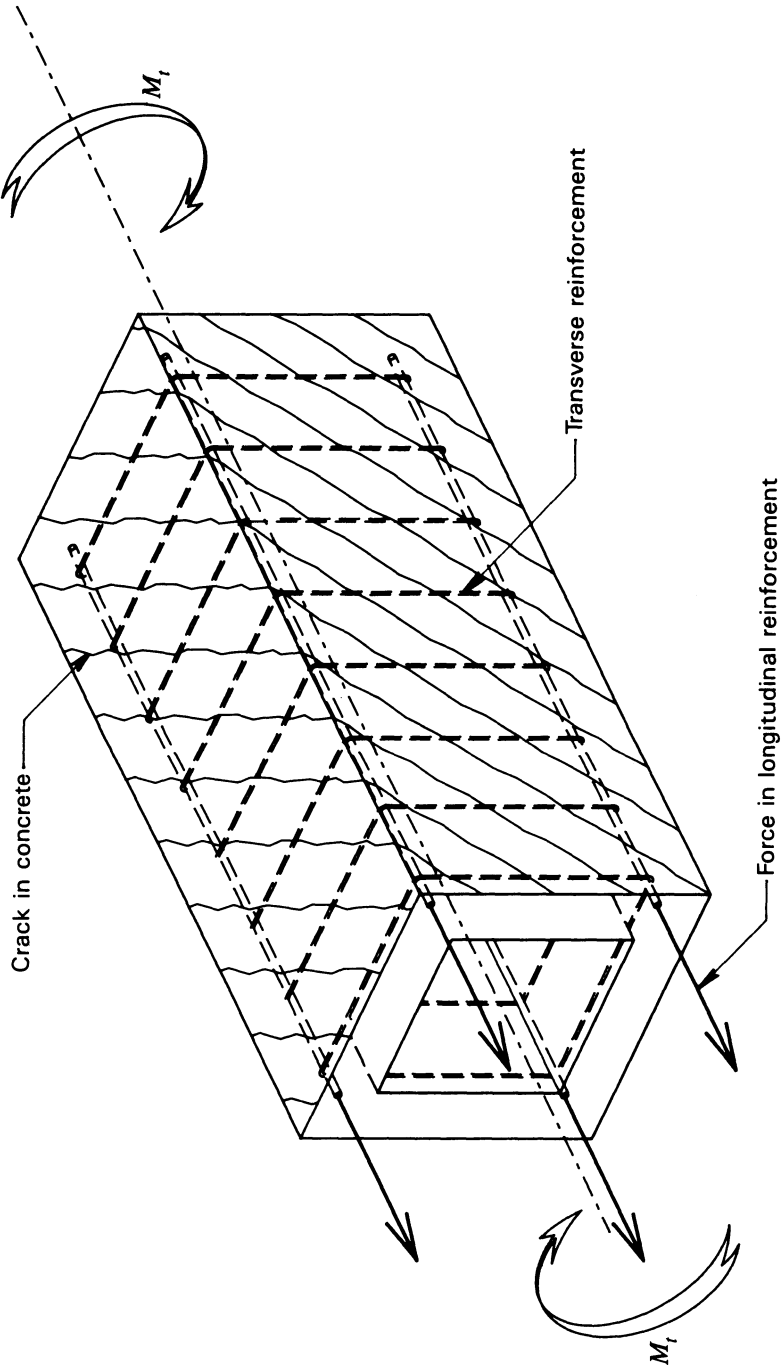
Reinforced concrete box beam subjected to a torsional moment showing the locations of the concrete cracks, compression struts, transverse shear stress reinforcement, and forces in the longitudinal reinforcement.
